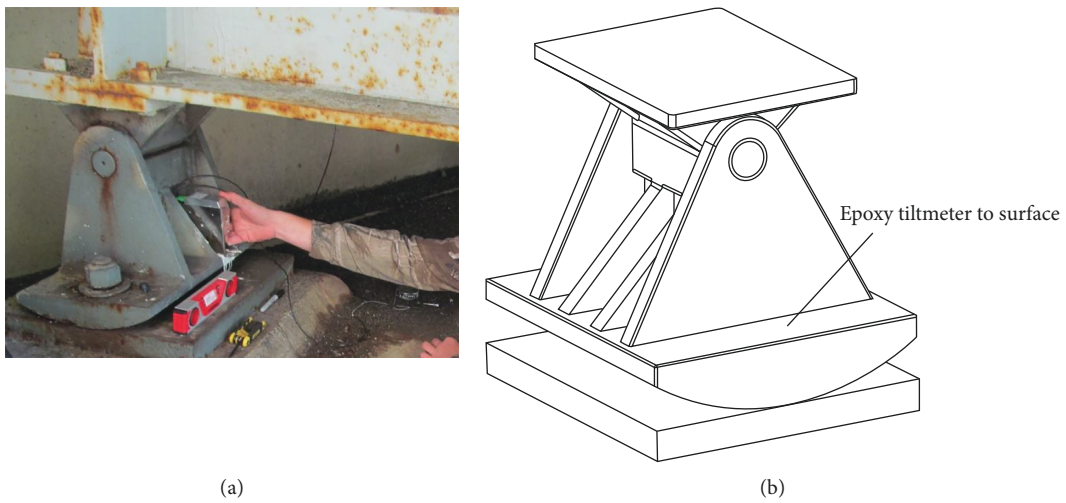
Picture of the tiltmeter: (a) installed tiltmeter on bearing and (b) three-dimensional drawing of bearing.
